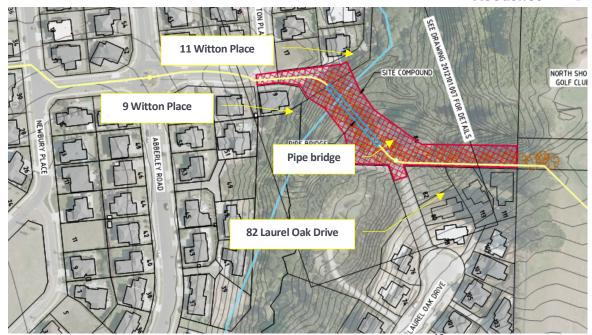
Location of proposed pipe bridge and adjacent dwellings 19
